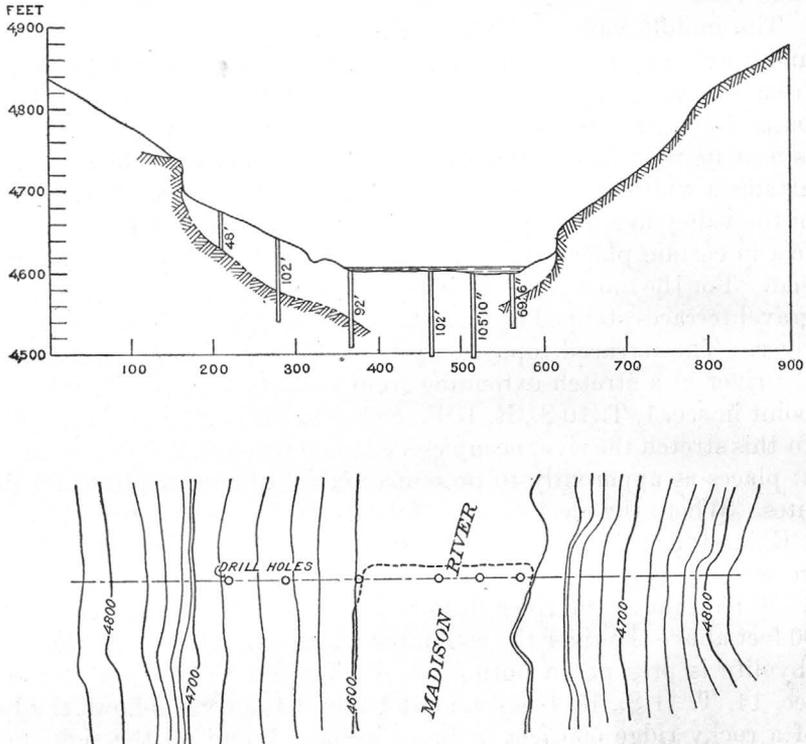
Cross section of Madison River in lower canyon section, showing drill holes made by Montana Power Co.
